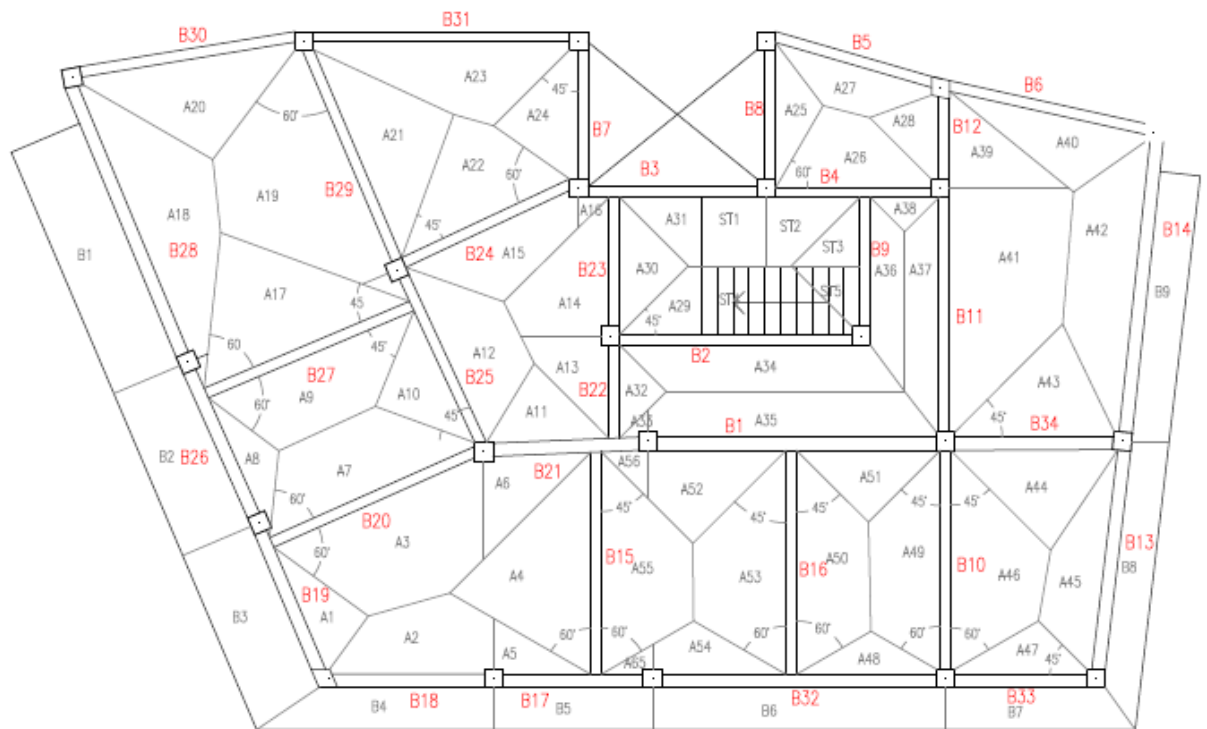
Distribution of Slab Load to the Beams – floor A (z= 9.03m)
